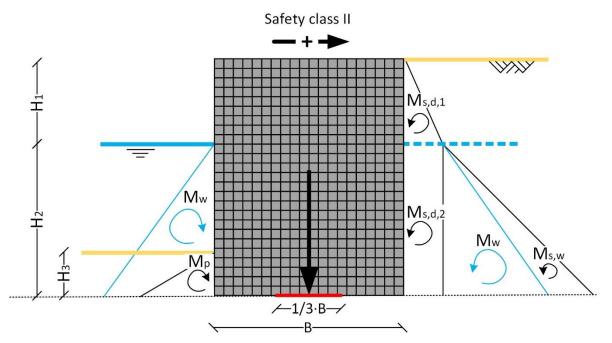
All relevant pressures, forces and dimensions for the failure mechanism 'Overturning'
